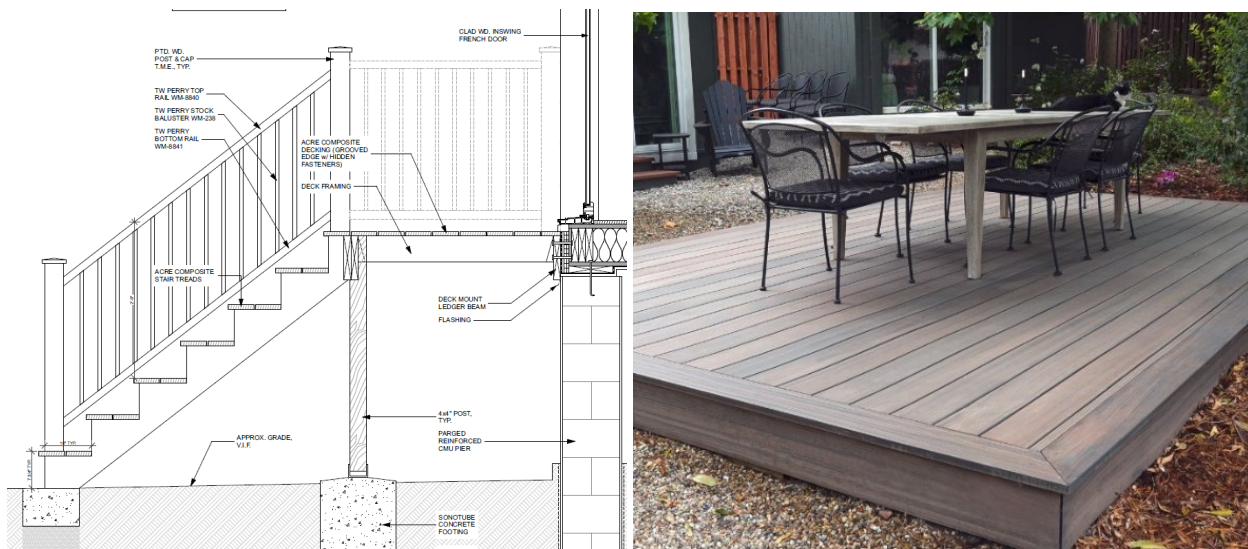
Proposed stair, landing, and railing detail (left), and example photograph of Acre composite decking with edge board installation. Staff notes that the edges of the boards are exposed in the proposed detail, and recommends a finished edge be added to the treads and landing.
